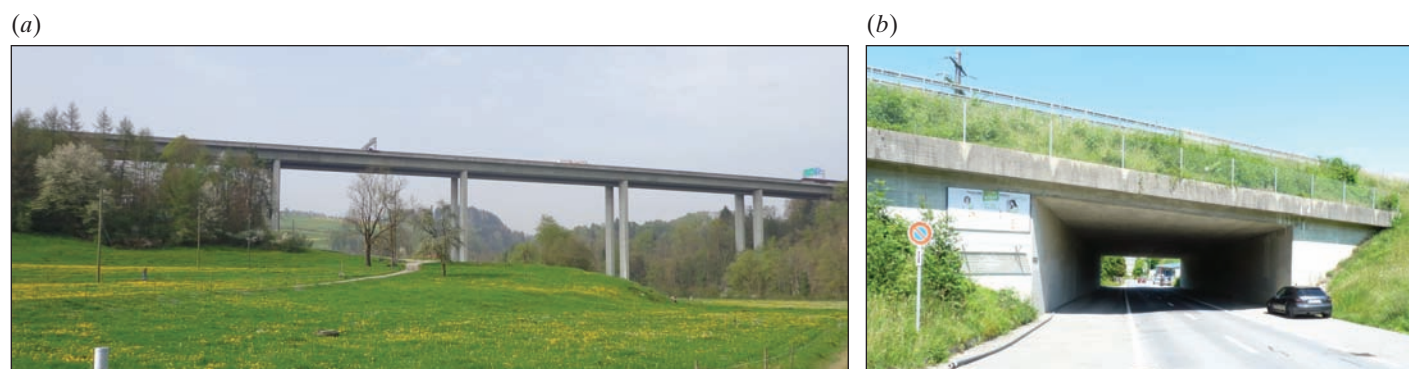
Longitudinal section of typical highway bridges: continuous spans box girders (a) and frames (b)
